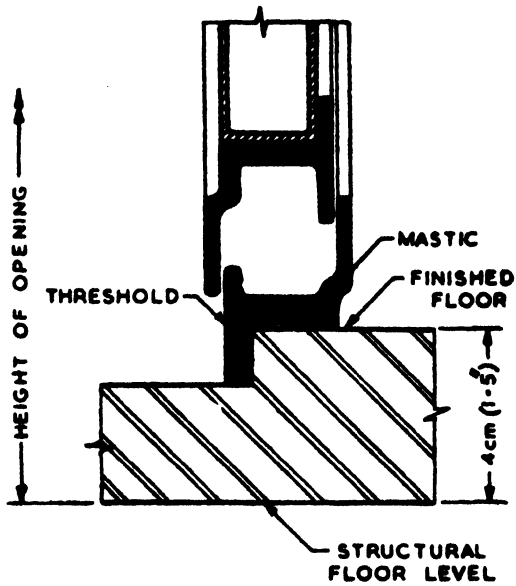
THRESHOLD DETAIL FOR EXTERNAL DOOR
